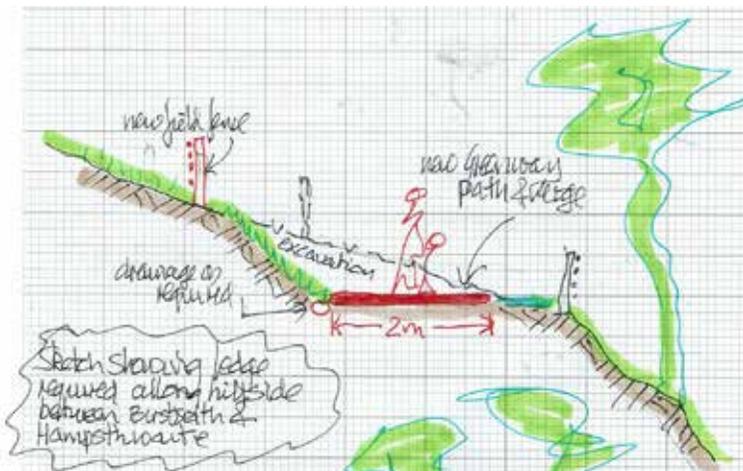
Sketch of section of hillside approaching bridge on the downstream side
